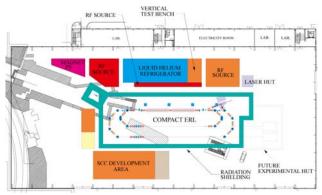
Planned layout of the Compact ERL in the East Counter Hall.
